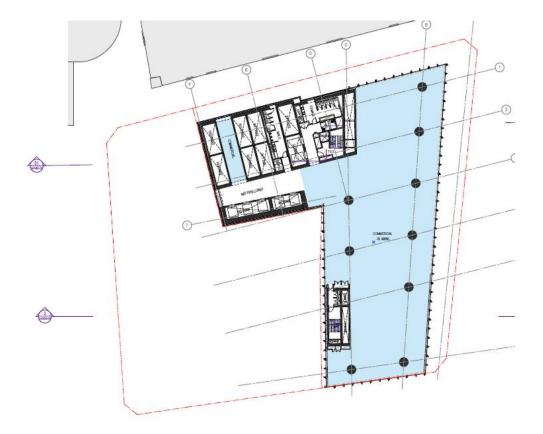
Proposed Level 20-27 - typical mid-rise commercial office floorplate
